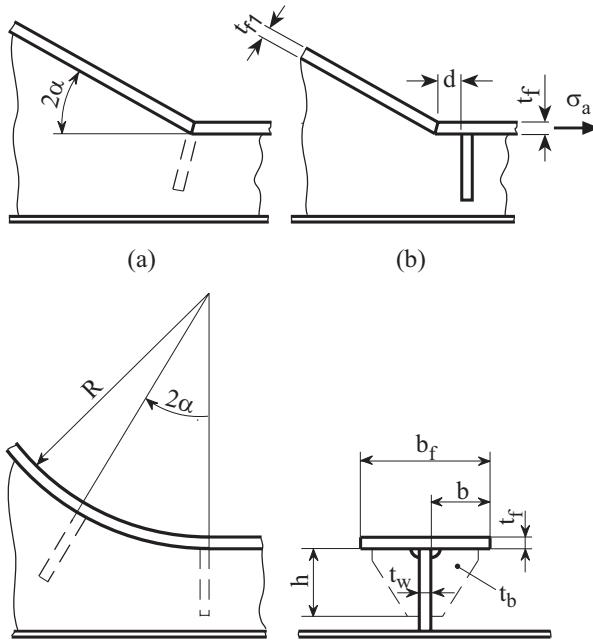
Typical stiffeners of rounded or knuckled face plates
